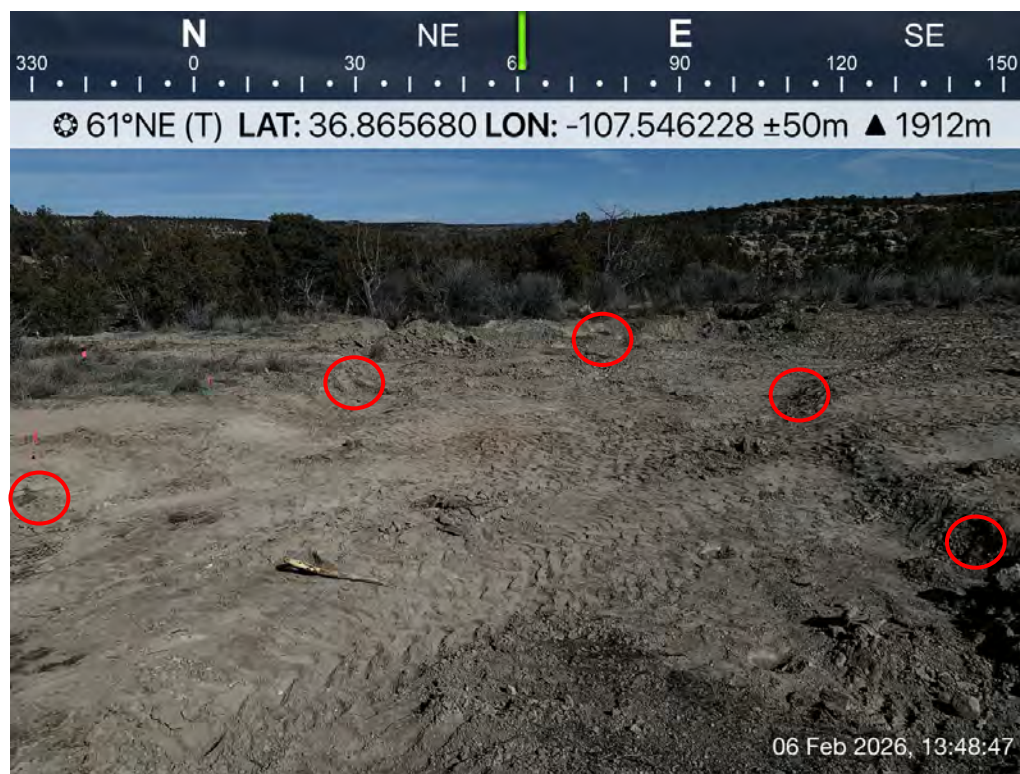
SS27 collected as a 5pct sample from the sidewalls of the release area excavation.
